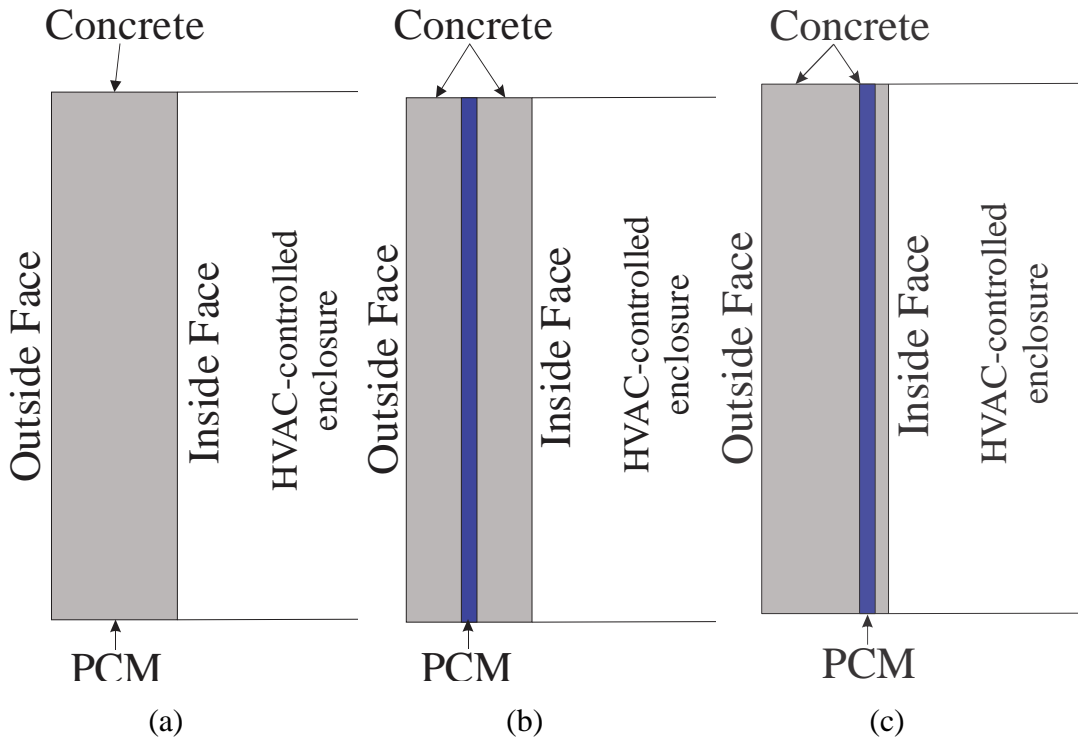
(a) Typical concrete wall, (b) Wall with a centrally placed PCM layer, and (c) PCM layer placed closer to the inside face
